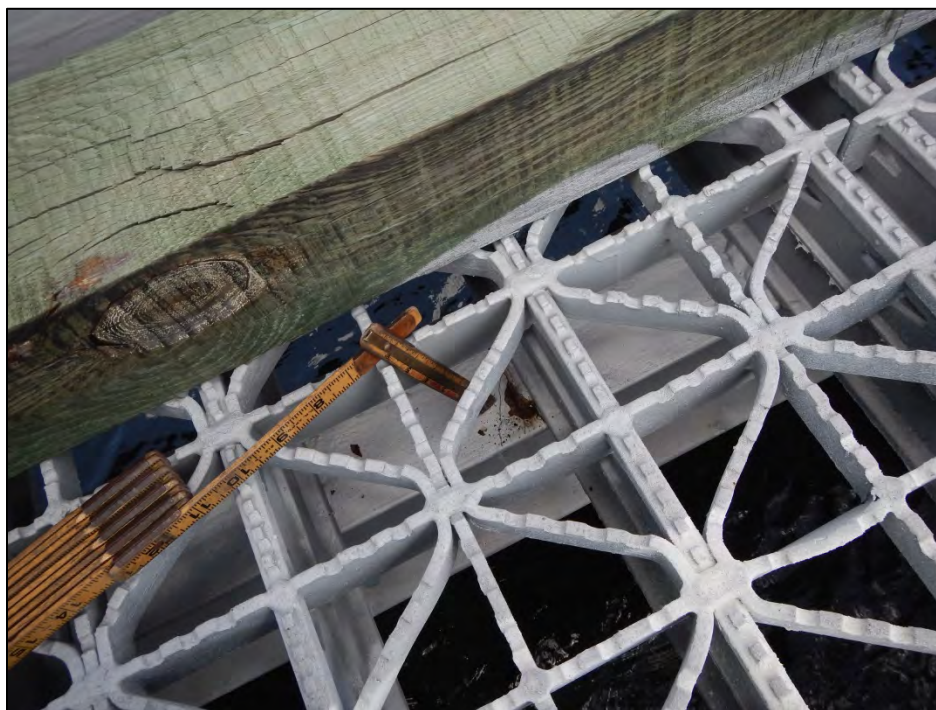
Cracked weld between main bar and Stringer 8-8.
